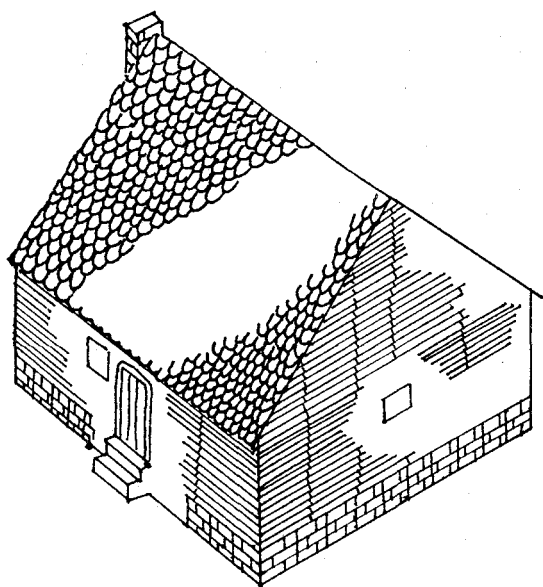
Reconstruction of the Stephens house with bricked-in cellar, chimney, and roofing tiles.
